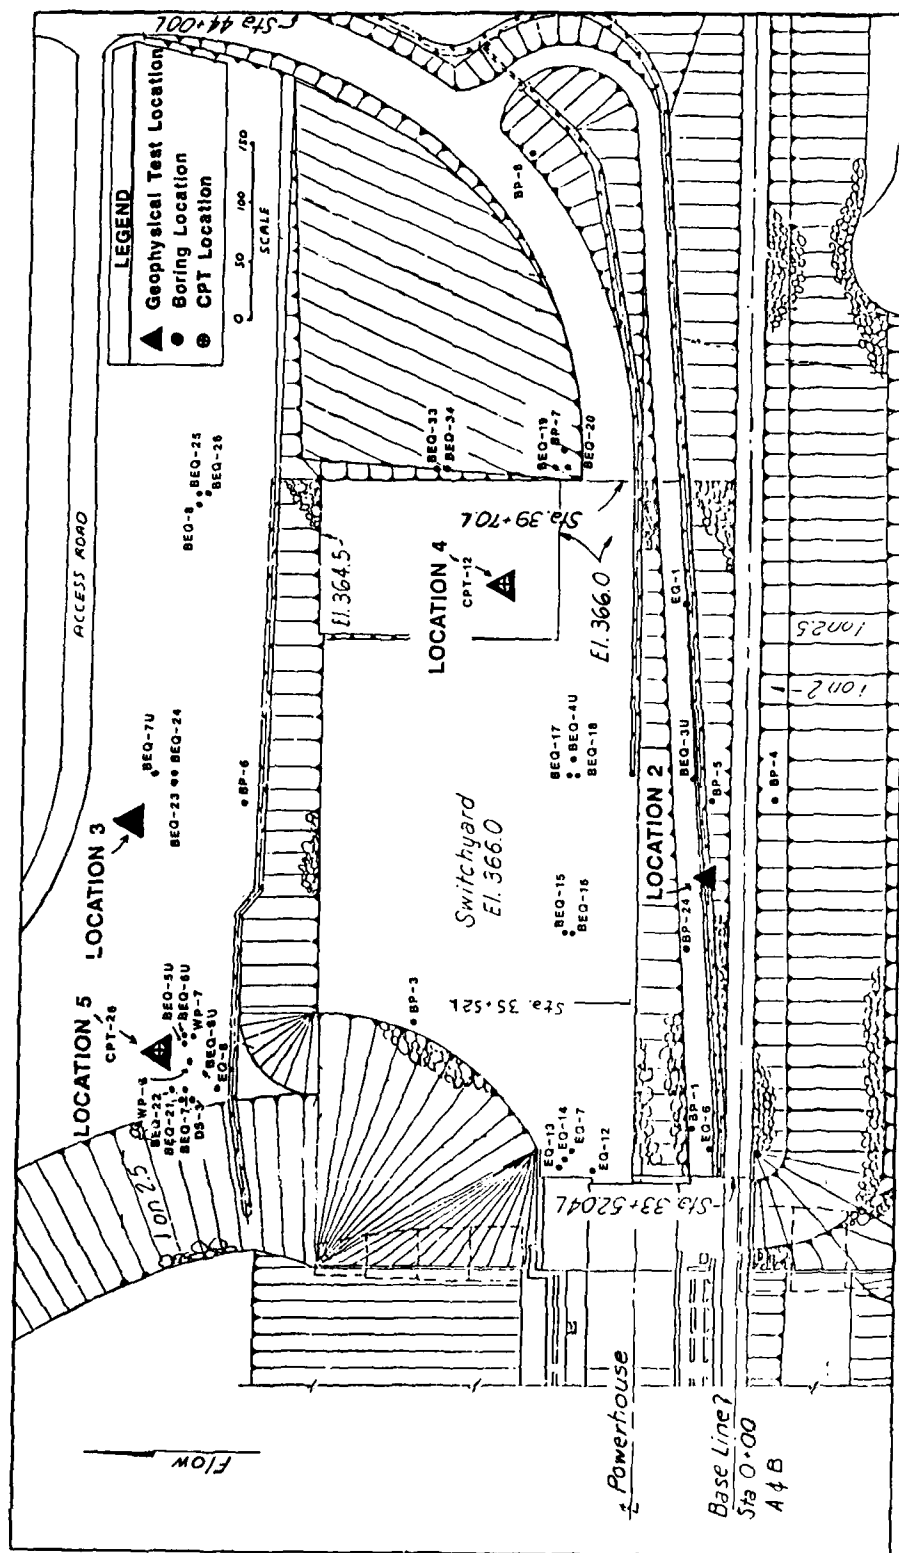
Detailed plan of field investigations in switchyard area at Barkley Dam
